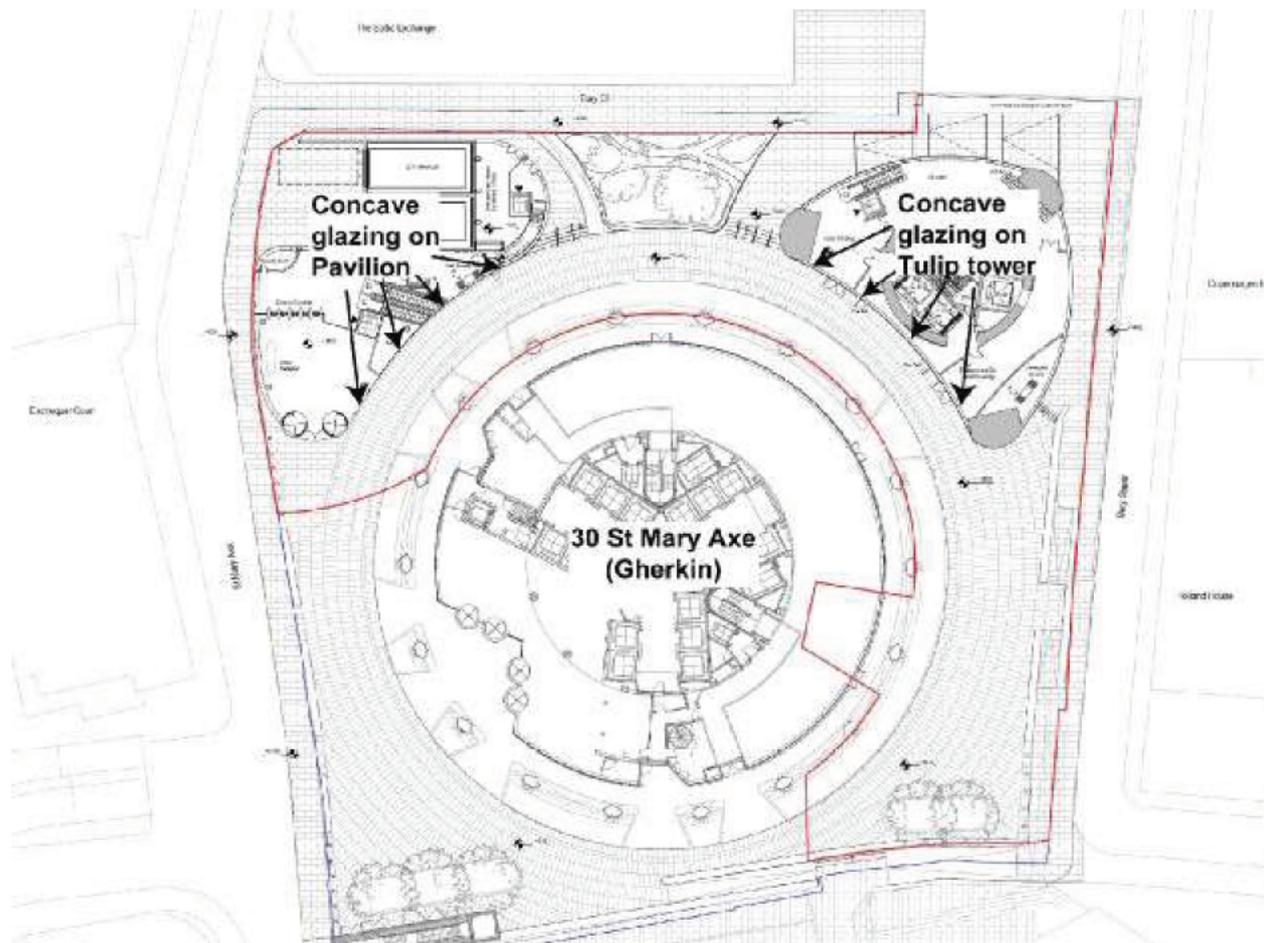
Ground floor plan by Foster and Partners, annotated to show location of concave glazing elements.
